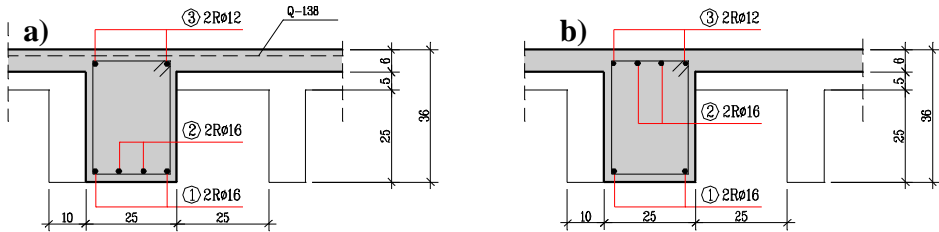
The new beam reinforcement plan: transversal cross-sections: a) in the span; b) in the support zone
